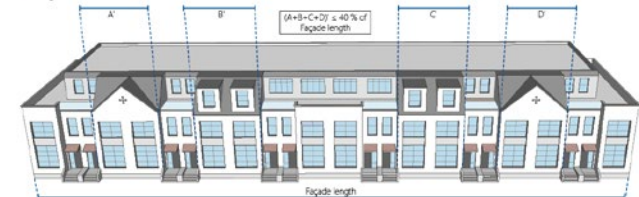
Visible sloped roofs are allowed to encroach into the required Upper Floor Stepback, up to a maximum width of 40% of the facade length.
